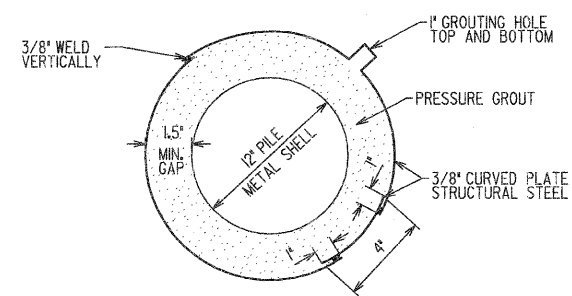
DETAIL FOR STRUCTURAL CONCRETE REPAIR
